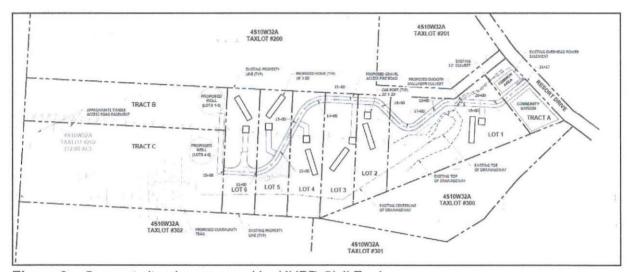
Concept site plan prepared by HHPR Civil Engineers.
